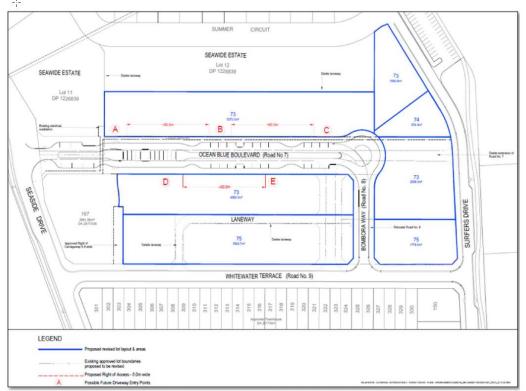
Originally proposed Plan submitted with Modification Application - detailing changes to the laneway
